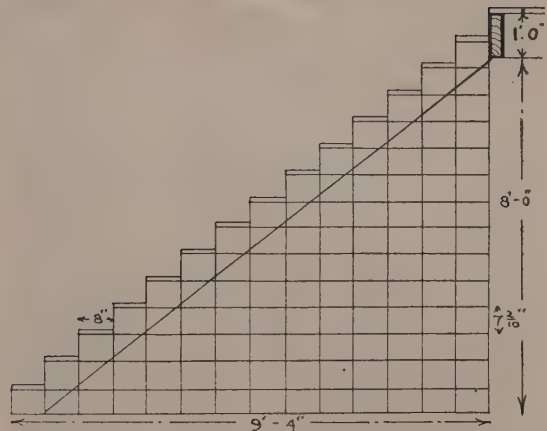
LAYING OUT STRINGER FOR ATTIC STAIR.
